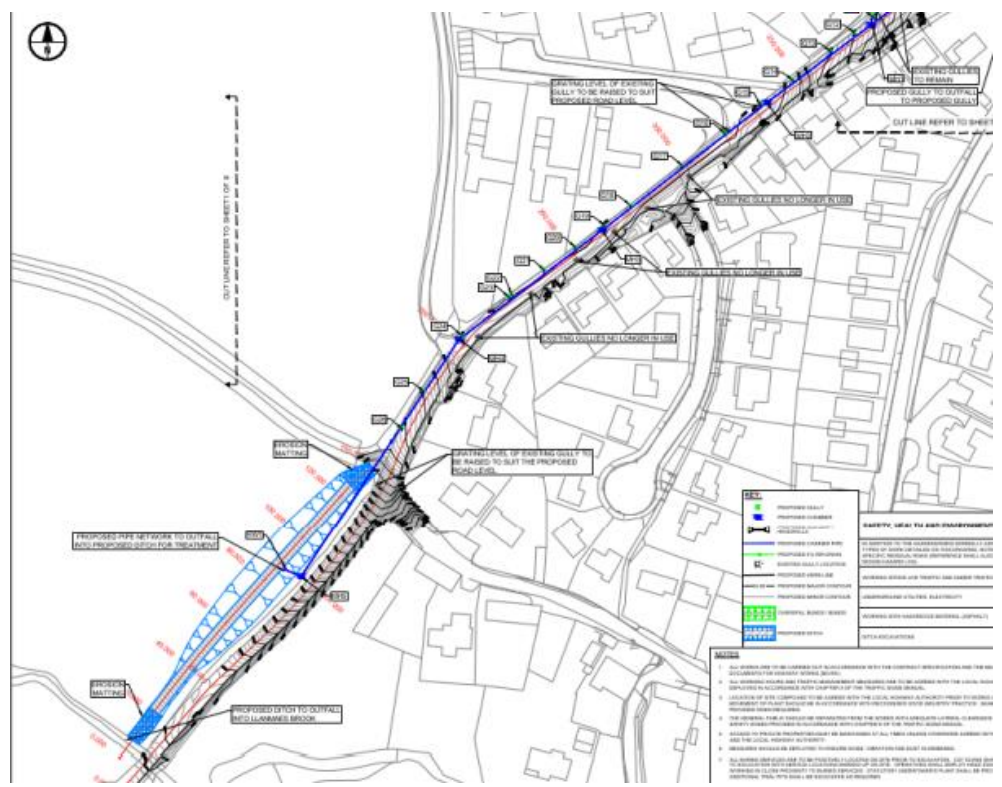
Road Repaving with New Gullies and Carrier Pipe Discharging to Ditch 3
